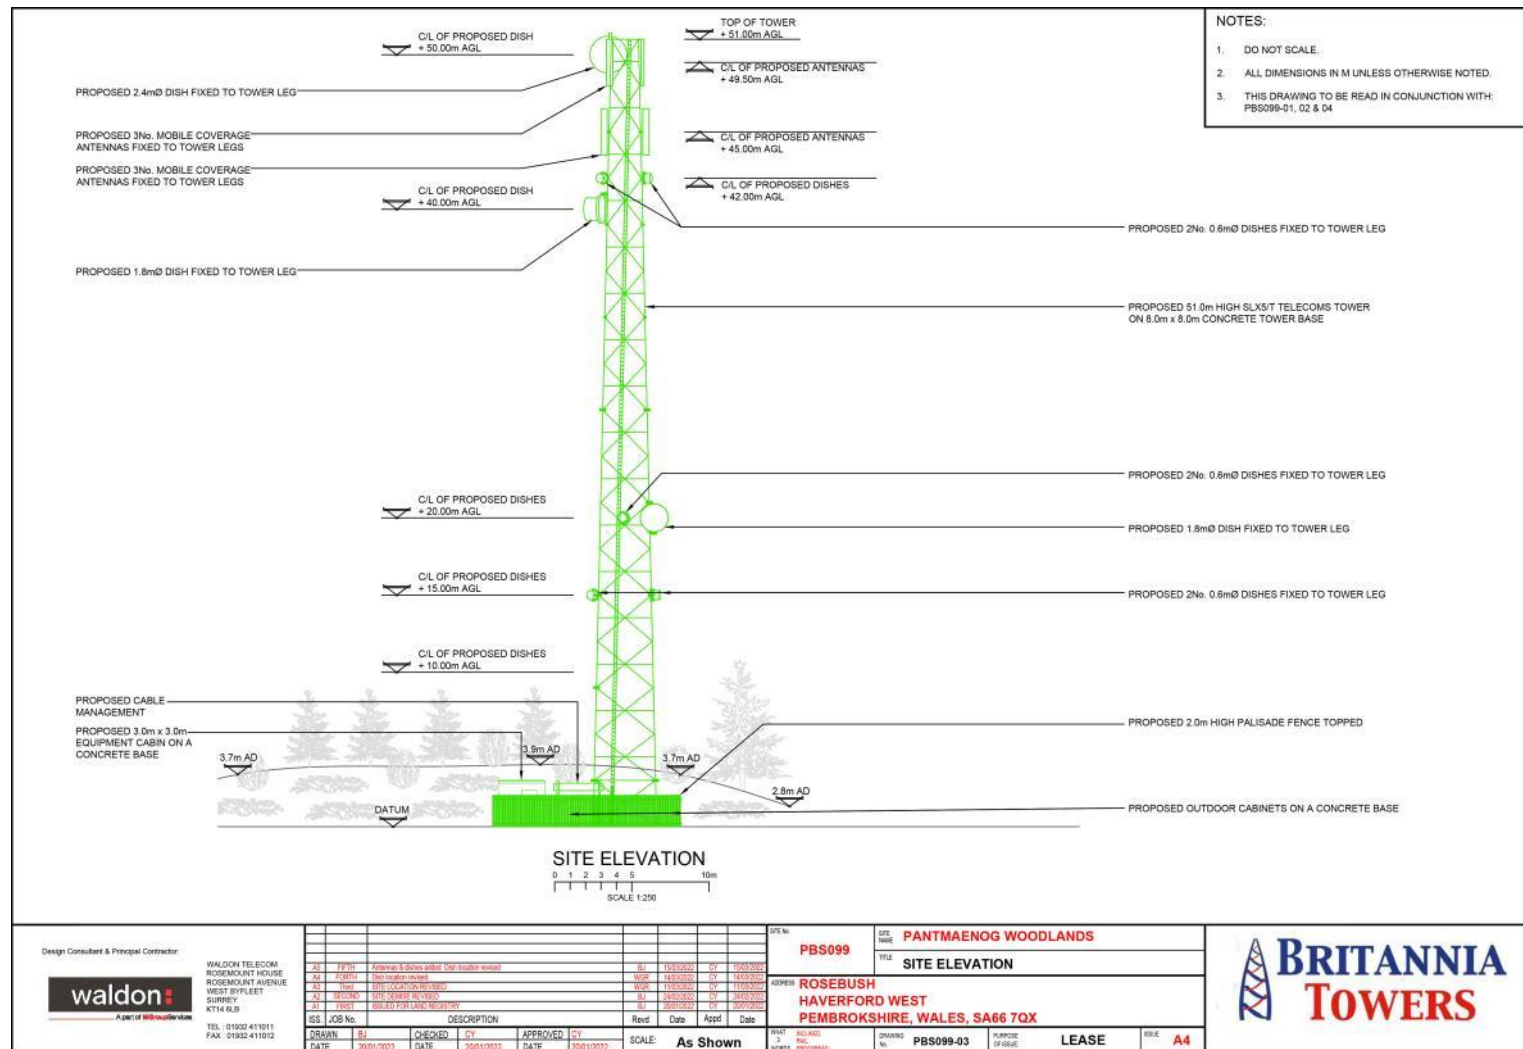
Proposed elevation of the telecommunications tower. Drawing provided by the client, not reproduced to original scale.
